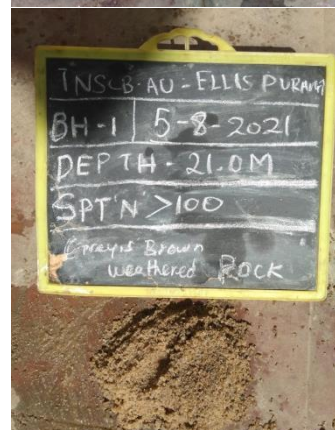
View of Soil Samples collected in 2 Borehole Locations at the Proposed Construction site.
